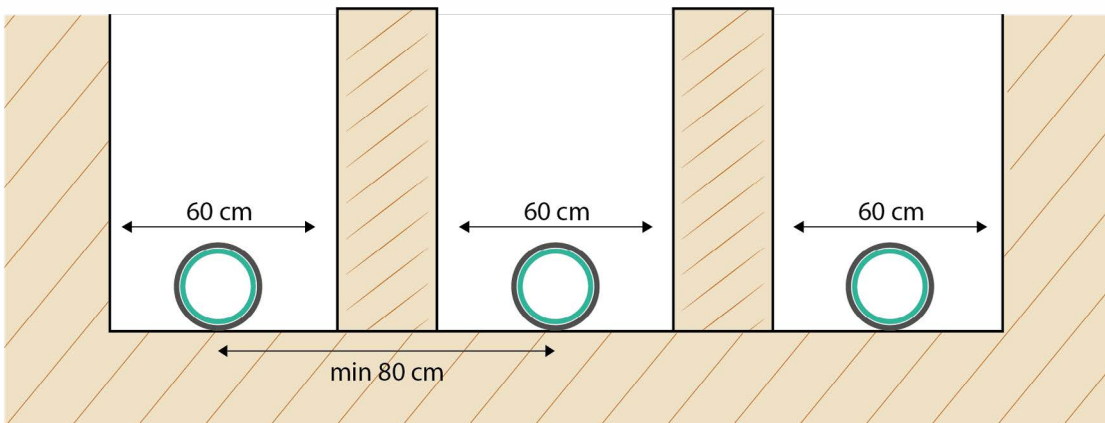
DIAGRAM OF TRENCH INSTALLATION
